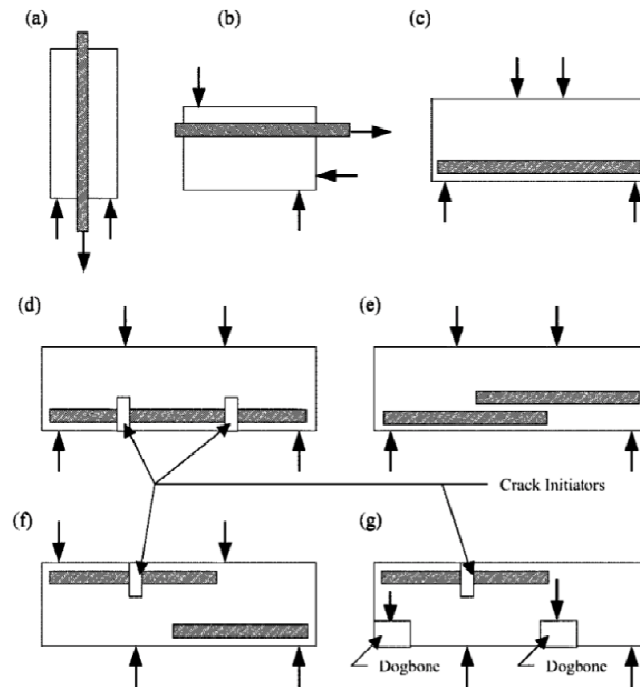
Bond test methods for reinforcing bars (a) pullout test; (b) beam-end test; (c) simply-supported beam test; (d) cracked beam test; (e) spliced beam test; (f) cantilever beam test; (g) cantilever beam test with dogbones (ACI Committee 440 2004)
